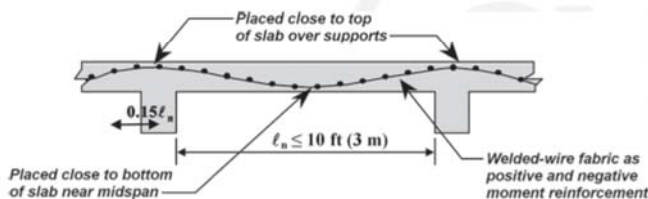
Welded wire reinforcement in short one-way spans.
